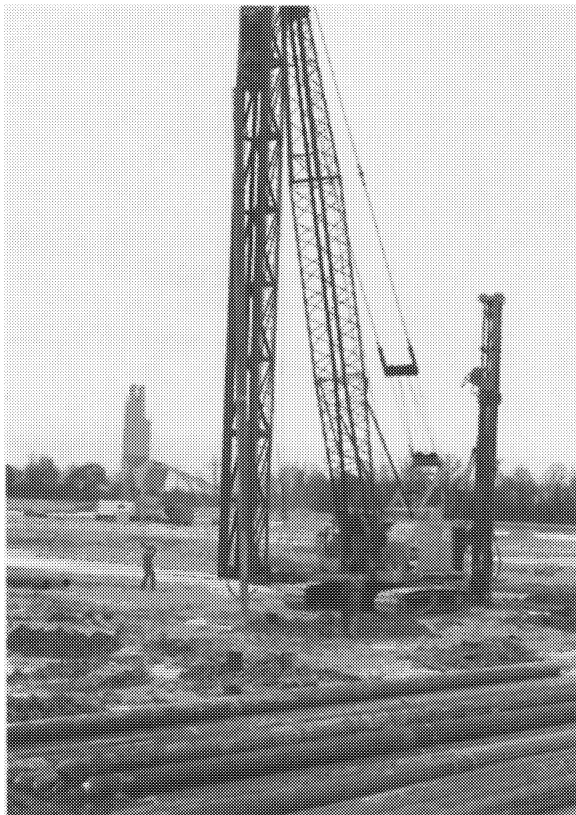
Installation of steel shell pile. [Ref. 15]
